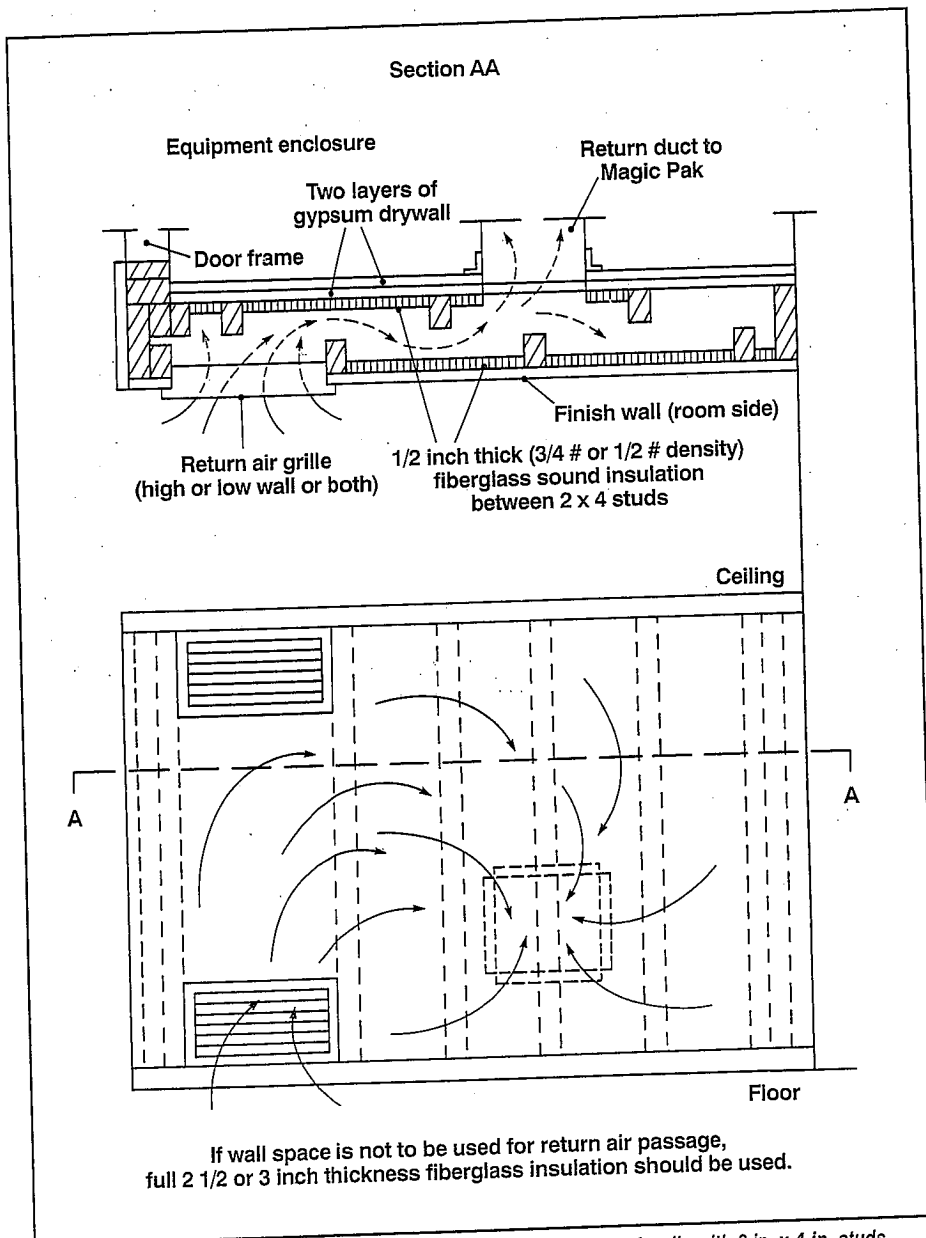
Line drawings, plan and elevation showing cross section of walls with 2 in. x 4 in. studs staggered on wide top and bottom plate for lateral air passage.
